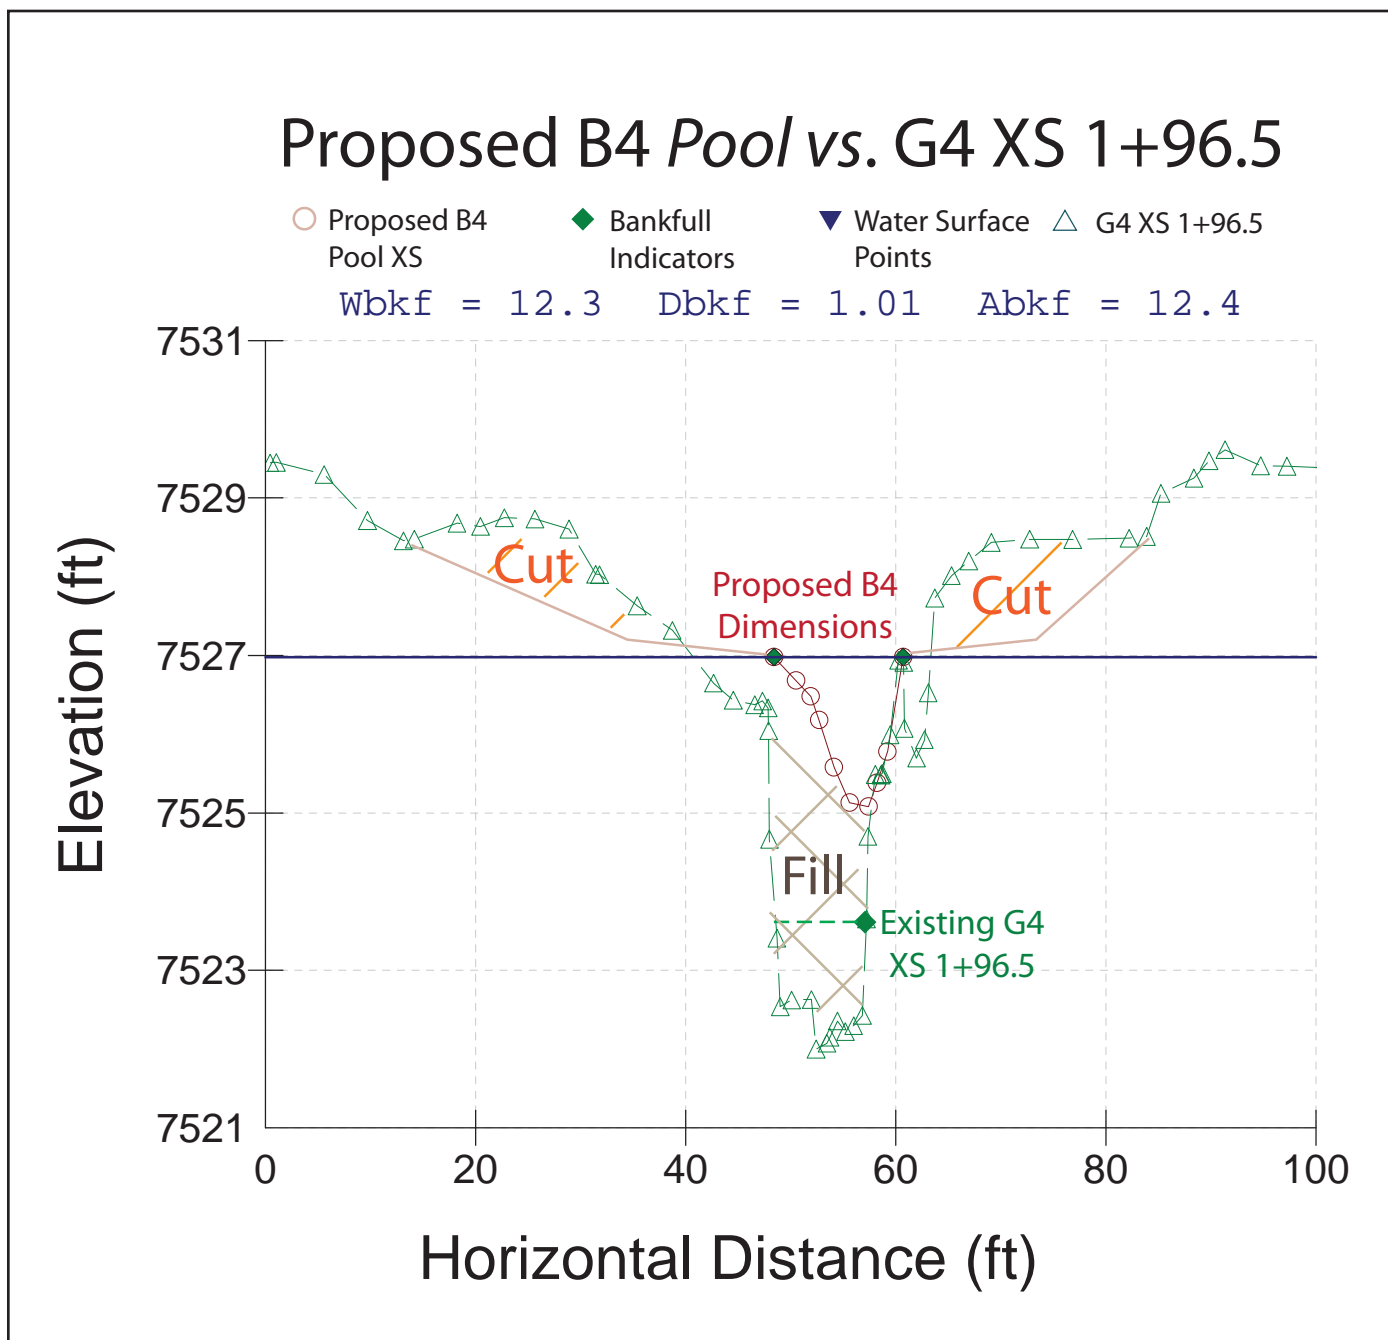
The proposed B4 *pool* cross-section compared to the existing G4 cross-section 1+96.5, indicating the cut and fill requirements and new bankfull elevation.
